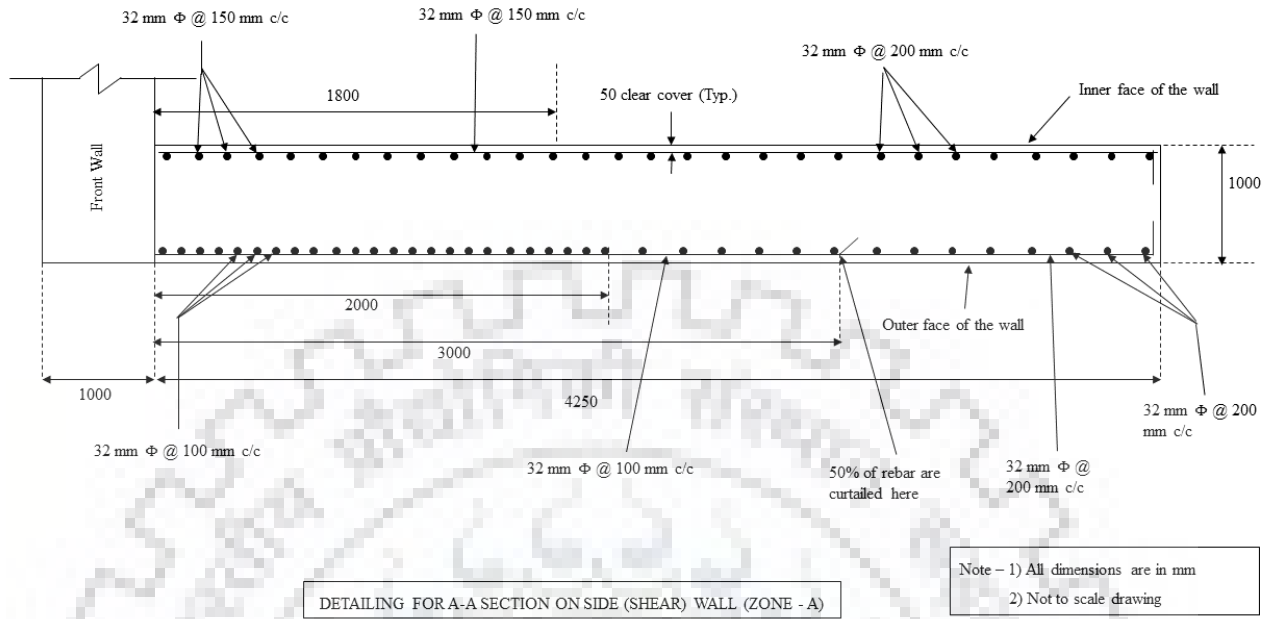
Detailing of Section A–A of shear wall for zone – A
